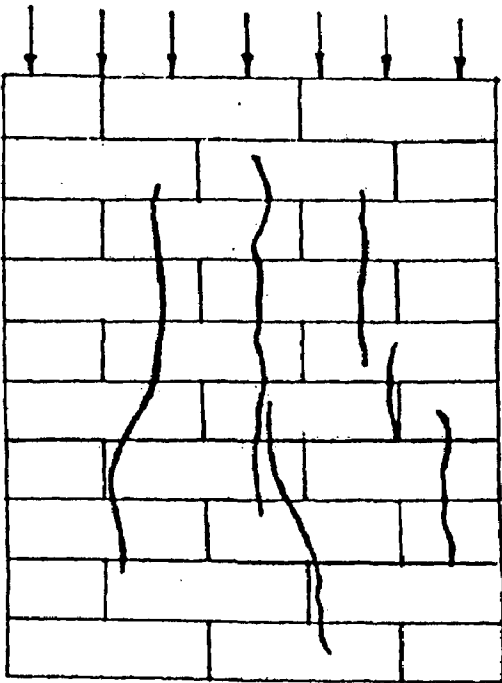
Typical Failure pattern in a brickwork wall
